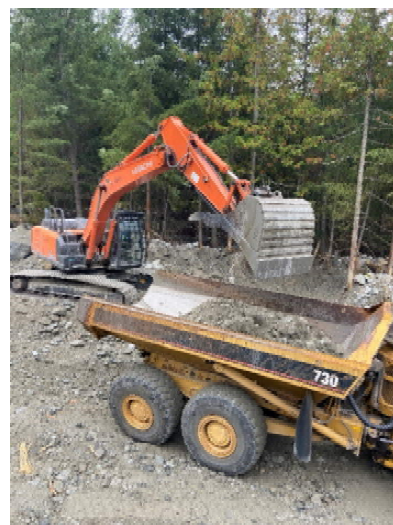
210 excavator loading rock truck with material for embankment at the downstream end of the site (2024-09-11 @ 2:06 PM)
